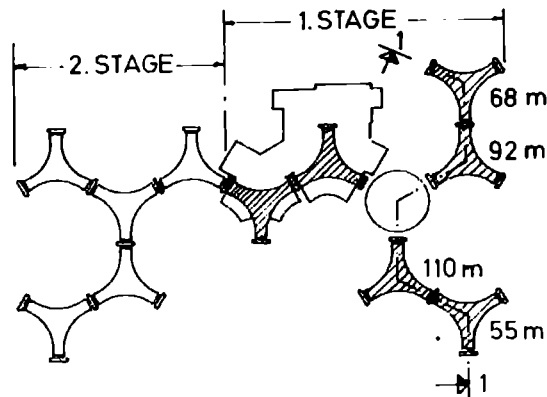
LOCATION AND HEIGHT OF BUILDINGS
